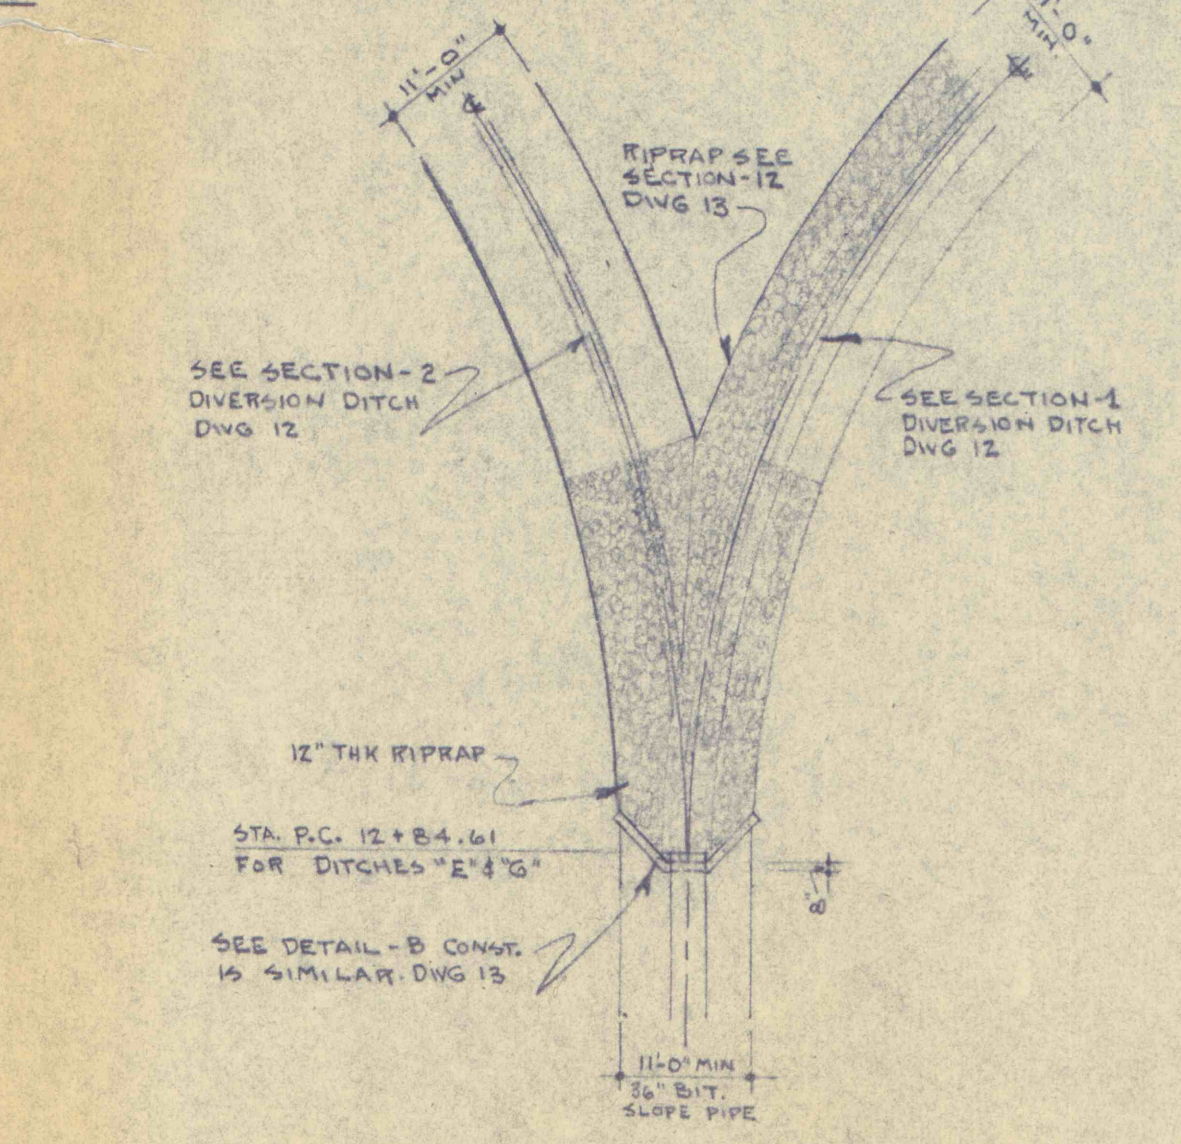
" PIPE ON DITCH "A" - (M)
